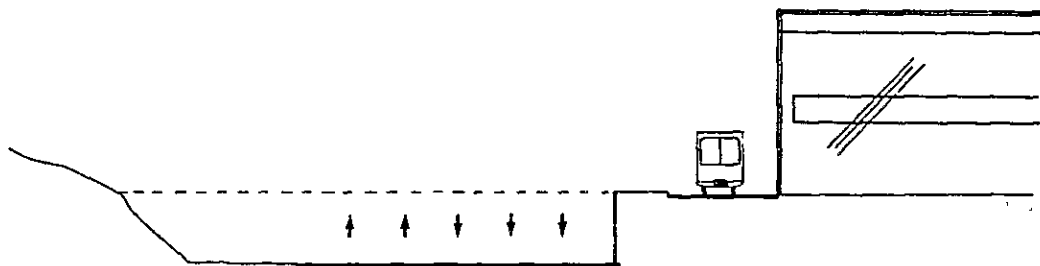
EXISTING CROSS SECTION OF VIA CERRO ANCON(2)
